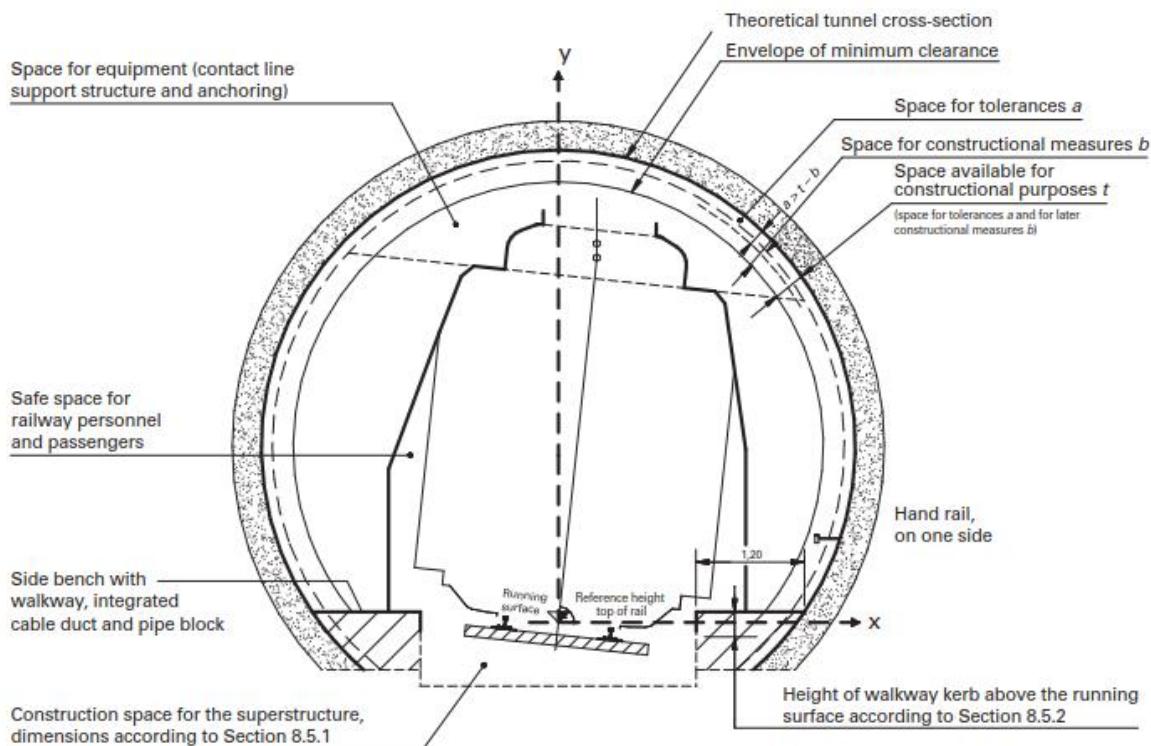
Typical code requirements for tunnel spaces (SIA 197-1 Design of Tunnels, Railway Tunnels, Switzerland).
